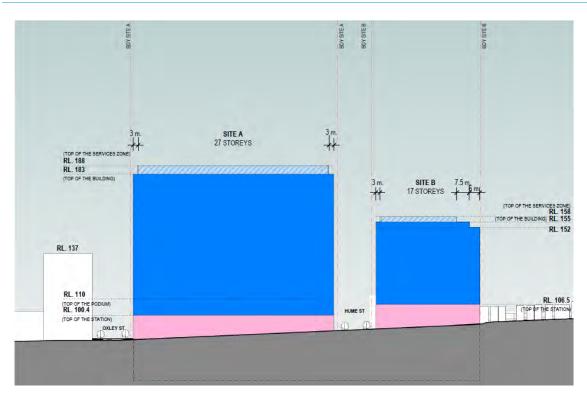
Proposed Crows Nest OSD building envelopes - west elevation (Pacific Highway)
